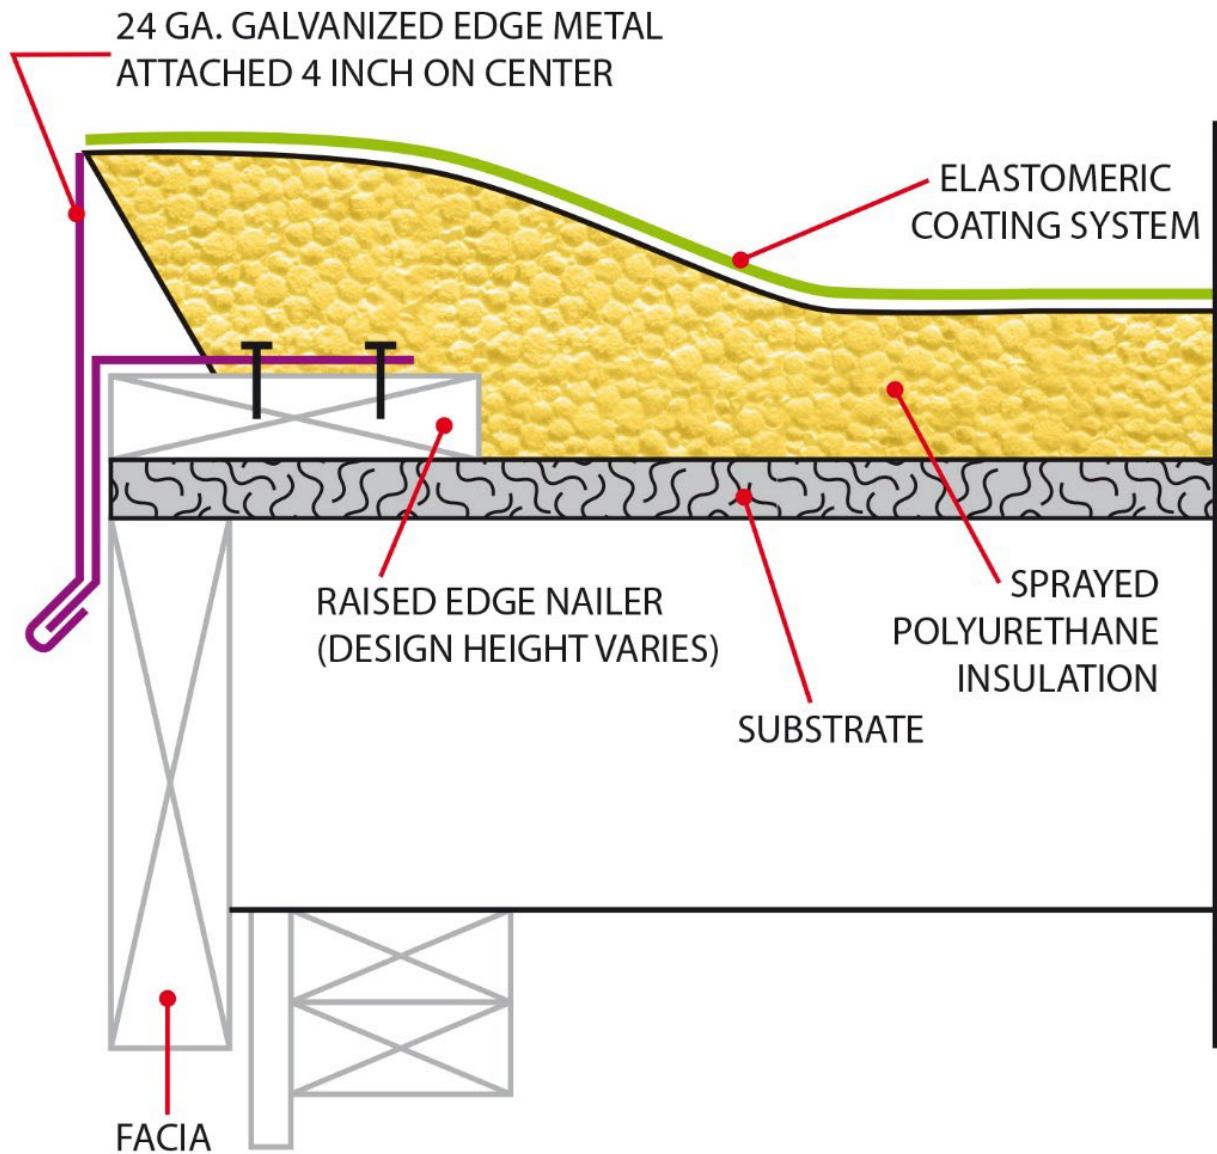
PARAPET WALL/ PERIMETER EDGE METAL FLASHING
